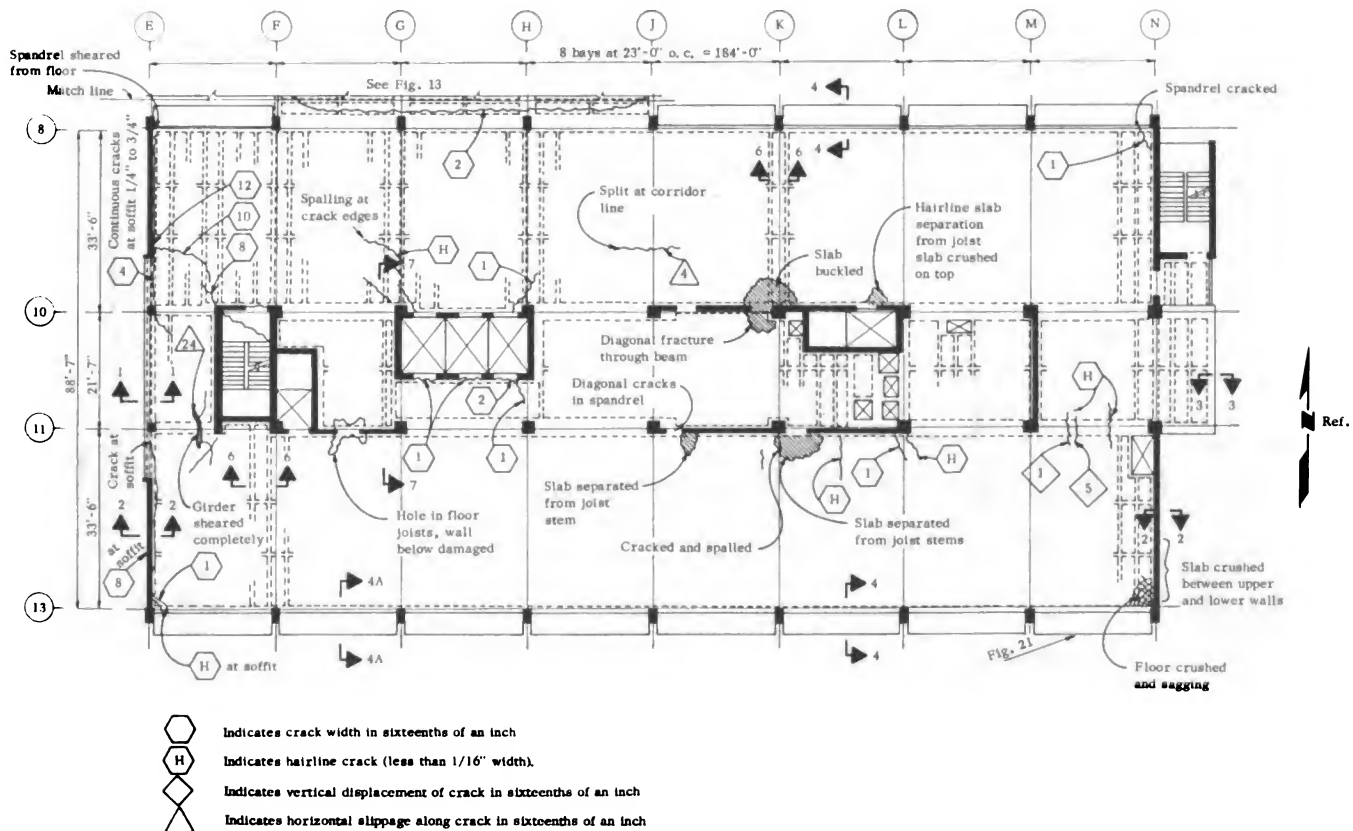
Holy Cross Hospital. Fourth-floor framing plan (7-story tower).
